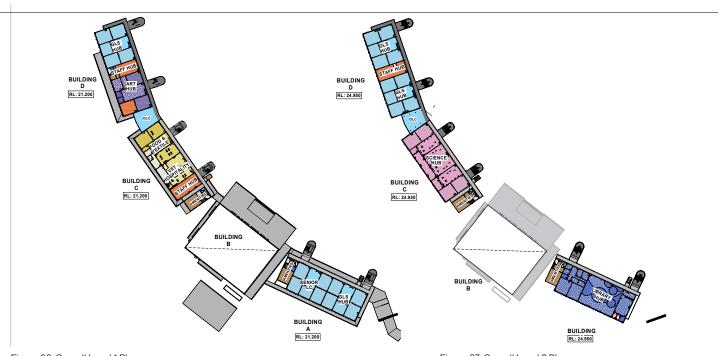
Overall Level 1 Plan. Source: EJE Architects, 2025.
